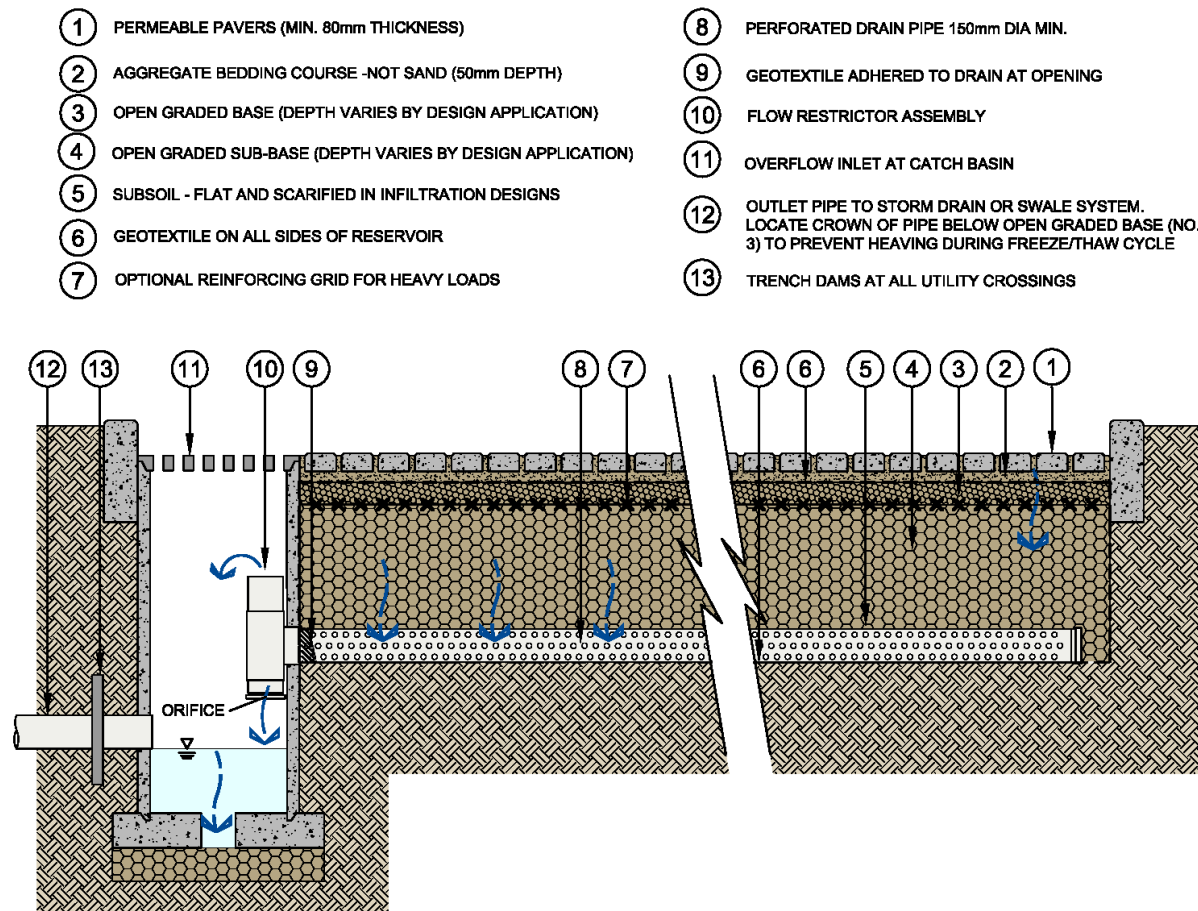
Pervious Paving – Partial Infiltration with Flow Restrictor (Not to Scale, Section)
